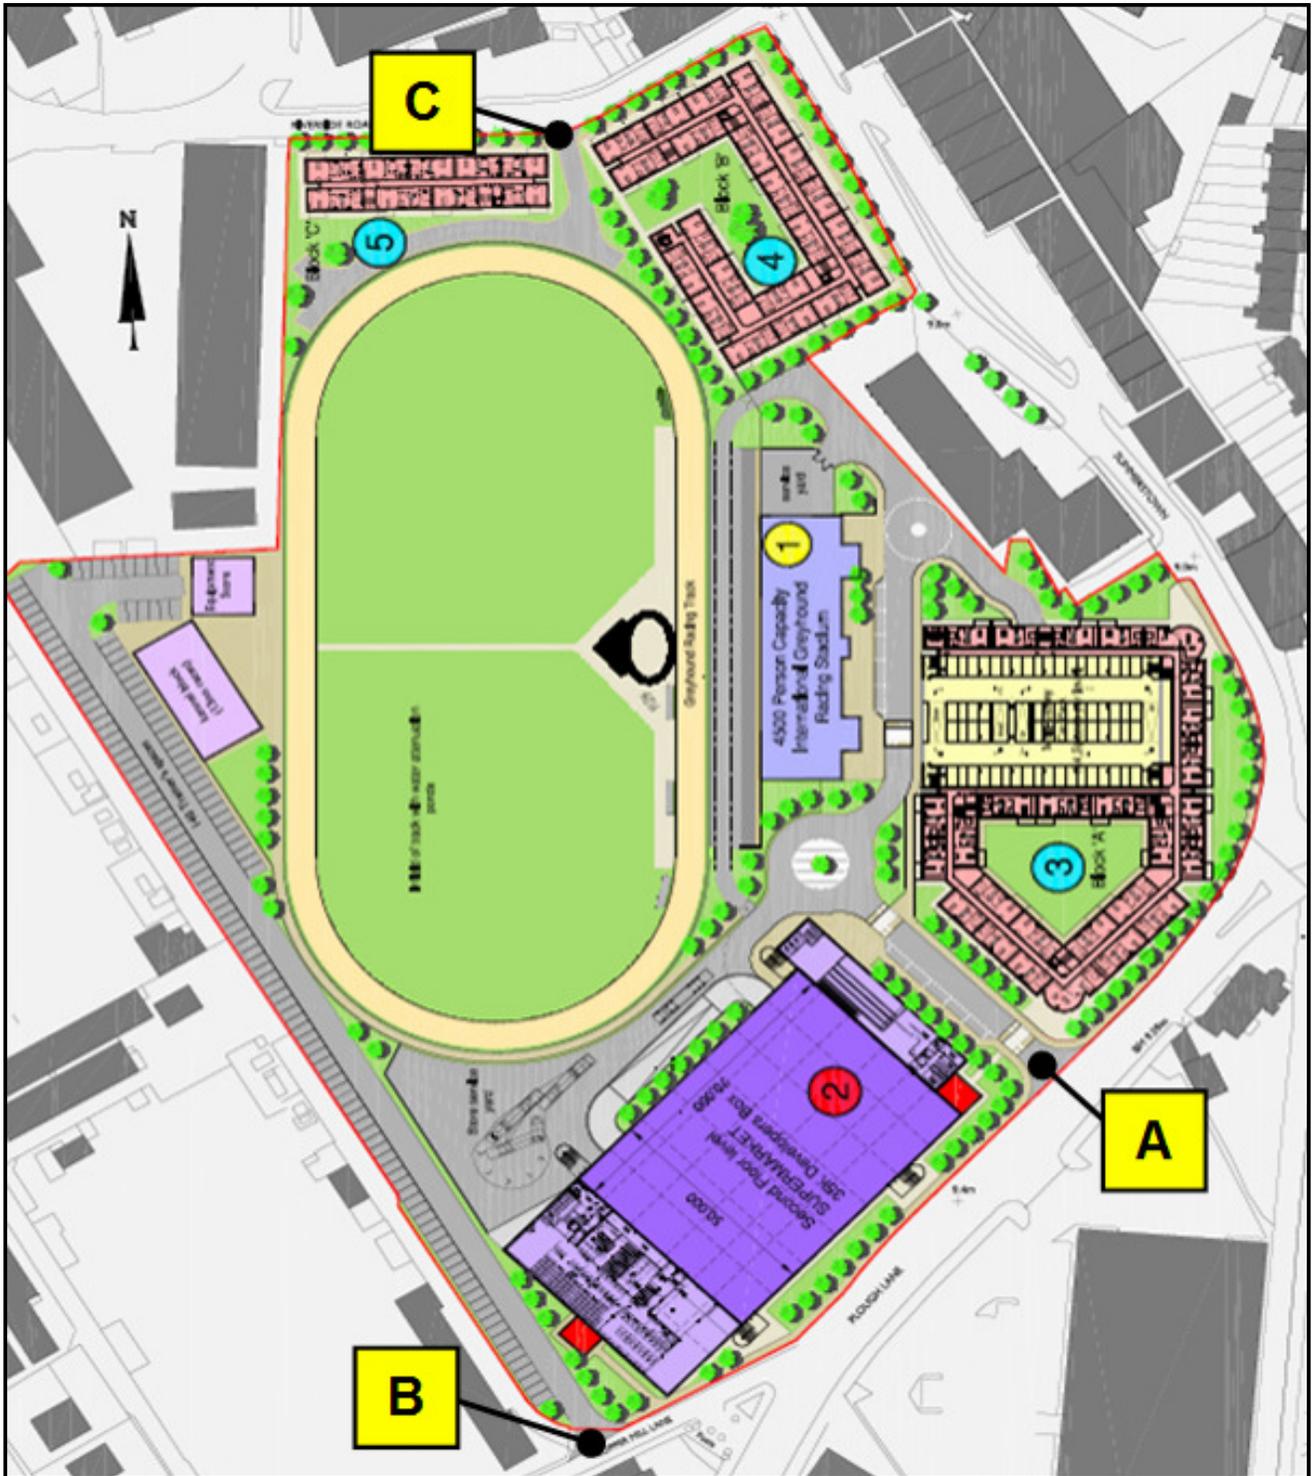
Proposed Development with Location of Site Accesses Highlighted (A, B & C)
